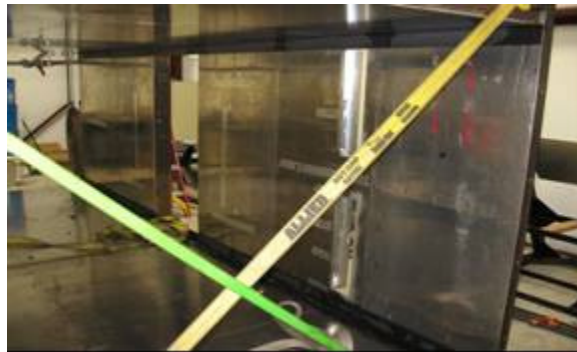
Right side view of the 5 ft x 7 ft test section
